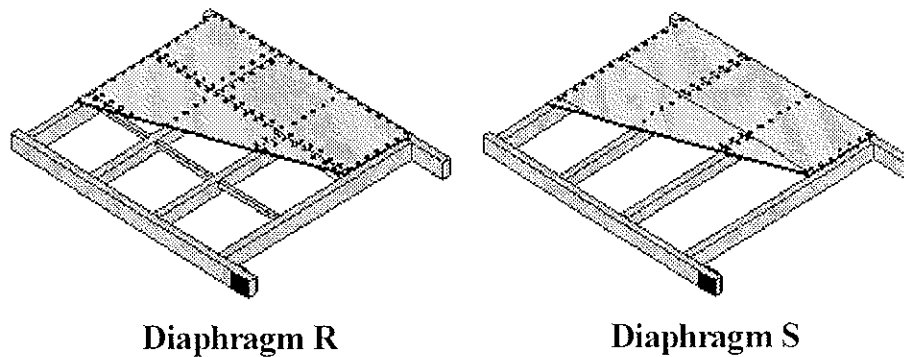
Floor framing and nail patterns of the horizontal diaphragm R and S
